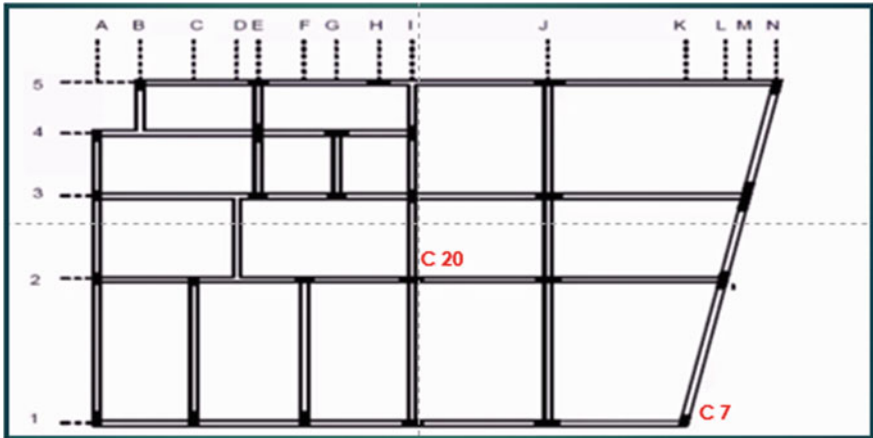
Structural plan for building considered for case study showing columns C7 and C20
